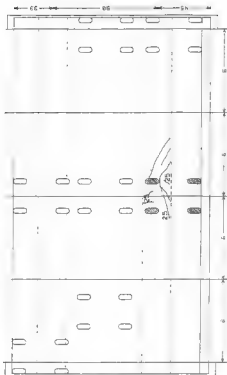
Bottom Cracking Pattern (Fifth Bridge - Test No 3)
